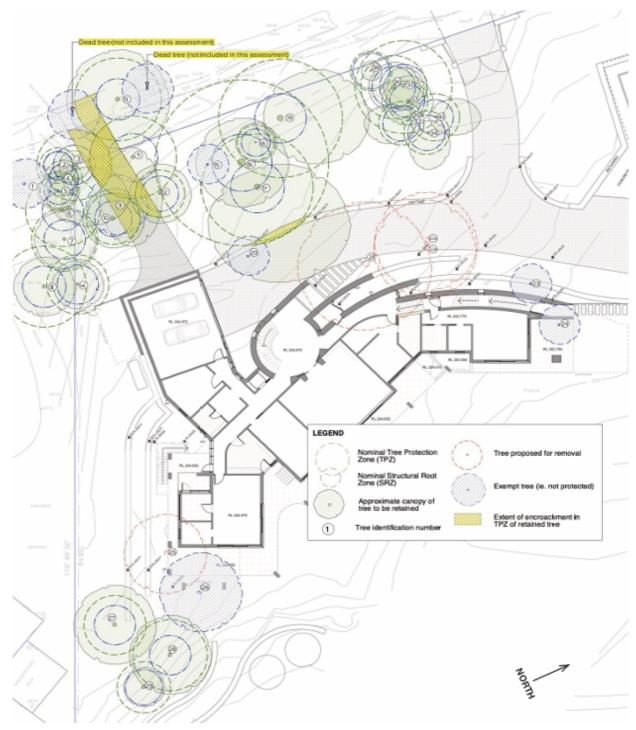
Proposed Site Plan showing an overlay of the protected and exempt trees using the proposed Site Plan as a base layer. The Tree Protection Zone (TPZ) and Structural Root Zone (SRZ) for the protected retained trees are indicated. The extent of proposed encroachment within the TPZ of the retained trees is indicated as yellow hatching. (Note, do not measure from drawings).
